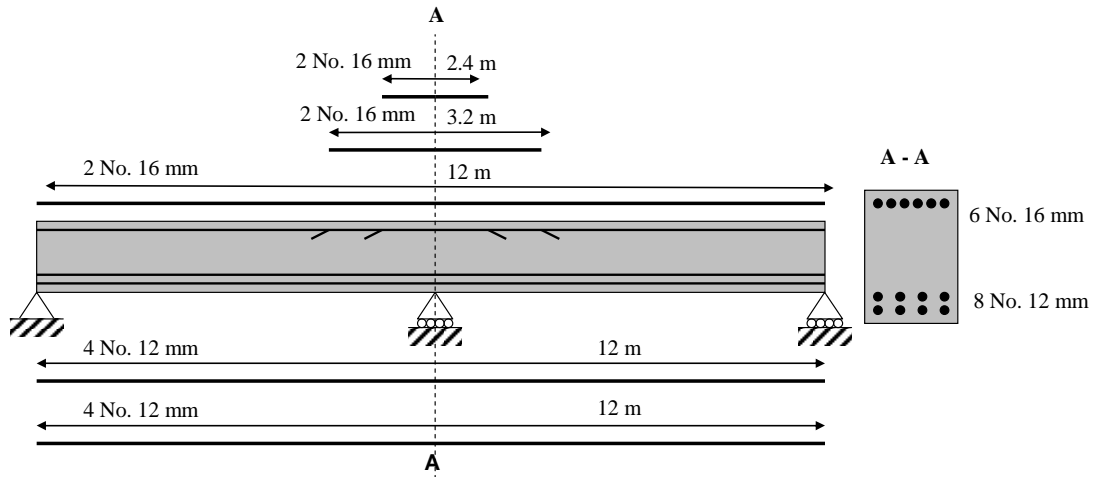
Reinforcement redistribution to improve spalling performance of a two span continuous reinforced concrete beam
